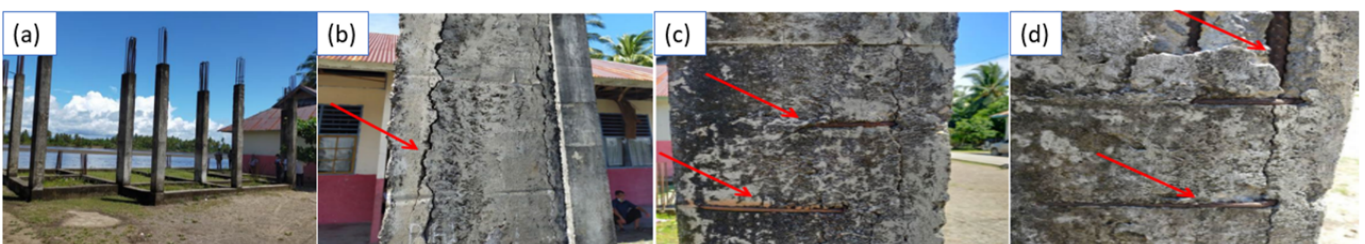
Condition of existing shelter building (a); Crack in the column structure (b); column reinforcement is visible (c); and the concrete cover is peeling off (d)
